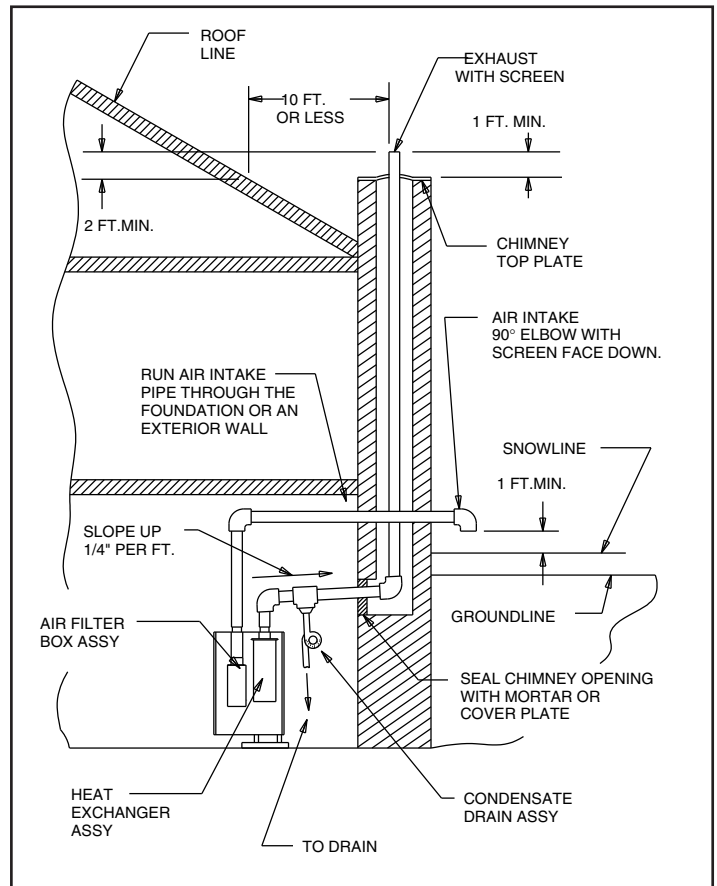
Vent piping vertically run up an existing chimney and air intake horizontally run out a vertical wall
